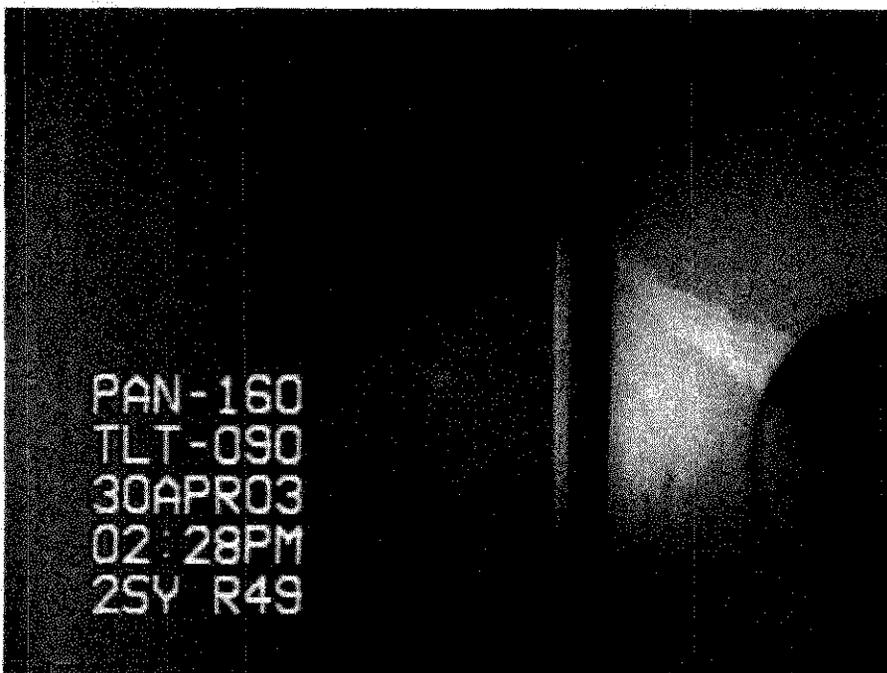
SY-102 Riser 49, Secondary Tank Wall (Left, 2003)
